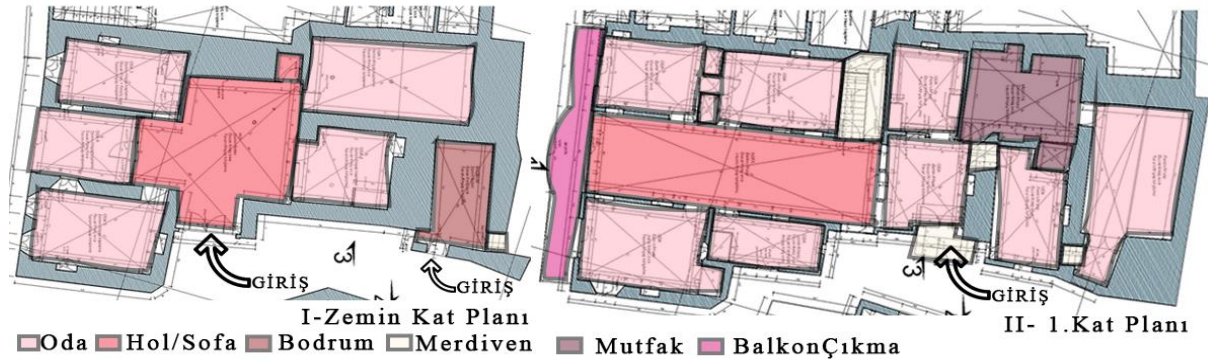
Spatial organization based on the ground floor and first-floor plans of Hacı Ali Ağa Mansion (Figure 17 and Figure 18)
